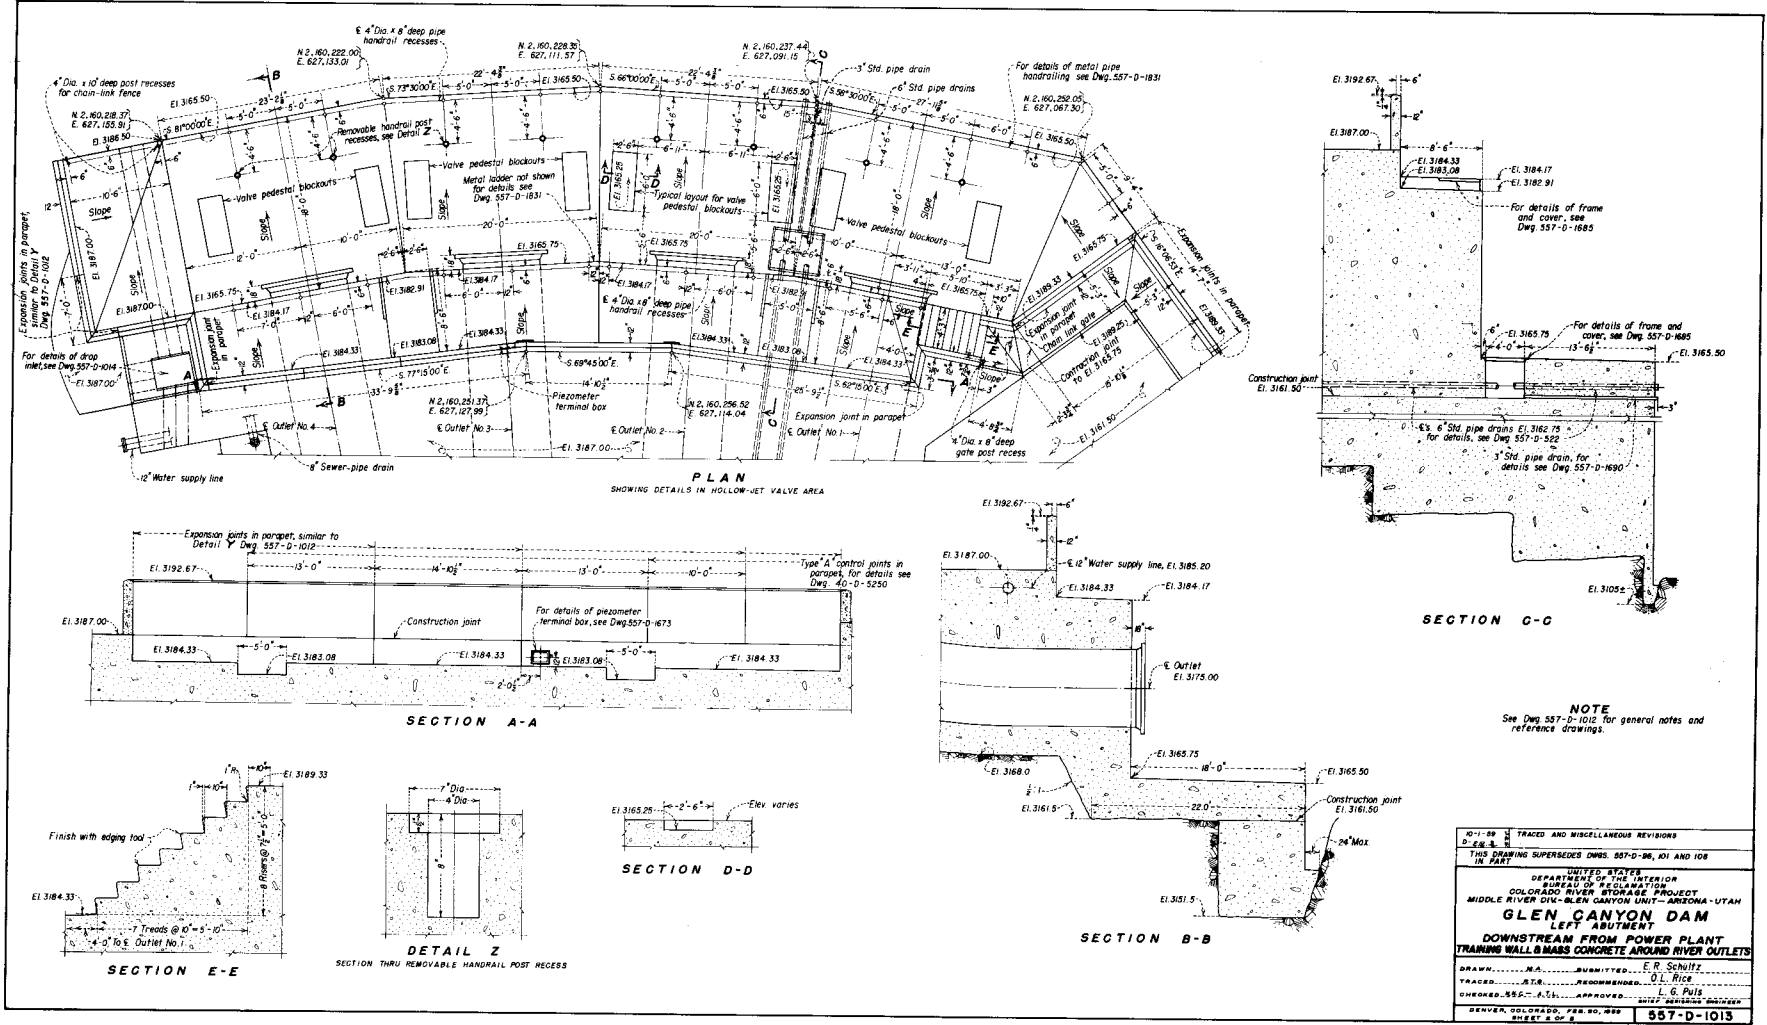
Left abutment downstream from powerplant—Training wall and mass concrete around river outlets. (Sheet 2 of 2.)
